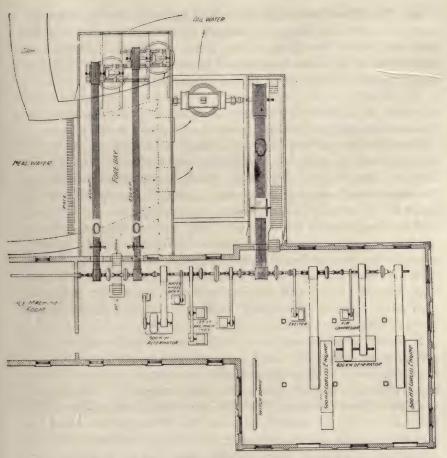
Plan Showing Harness, Rope Drive and Jackshaft. Southwest Missouri Light Co.\* (see page 540).
